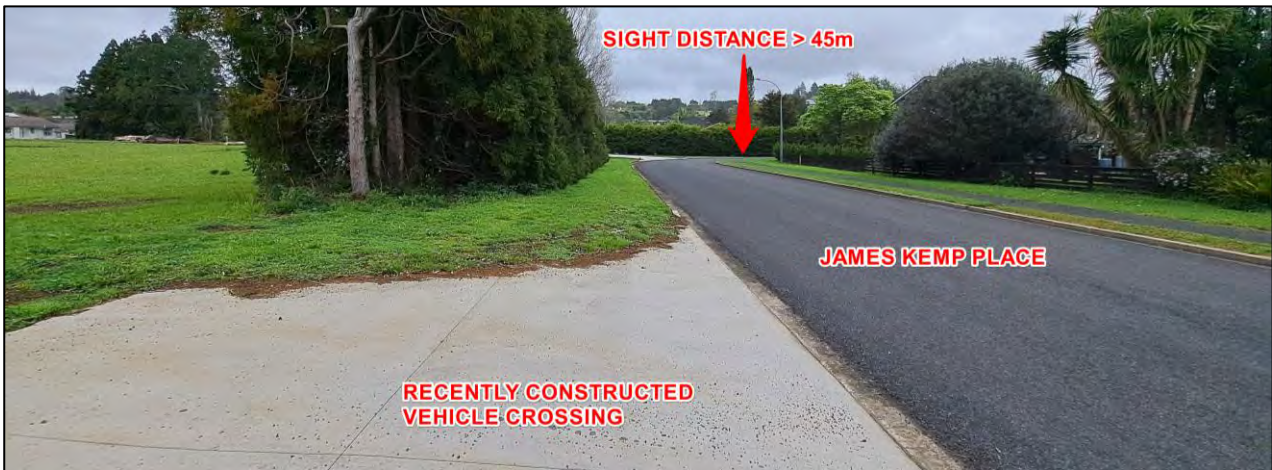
Recently Constructed Access Point on James Kemp Place Facing Southeast, >45m Sight Distance Available.
